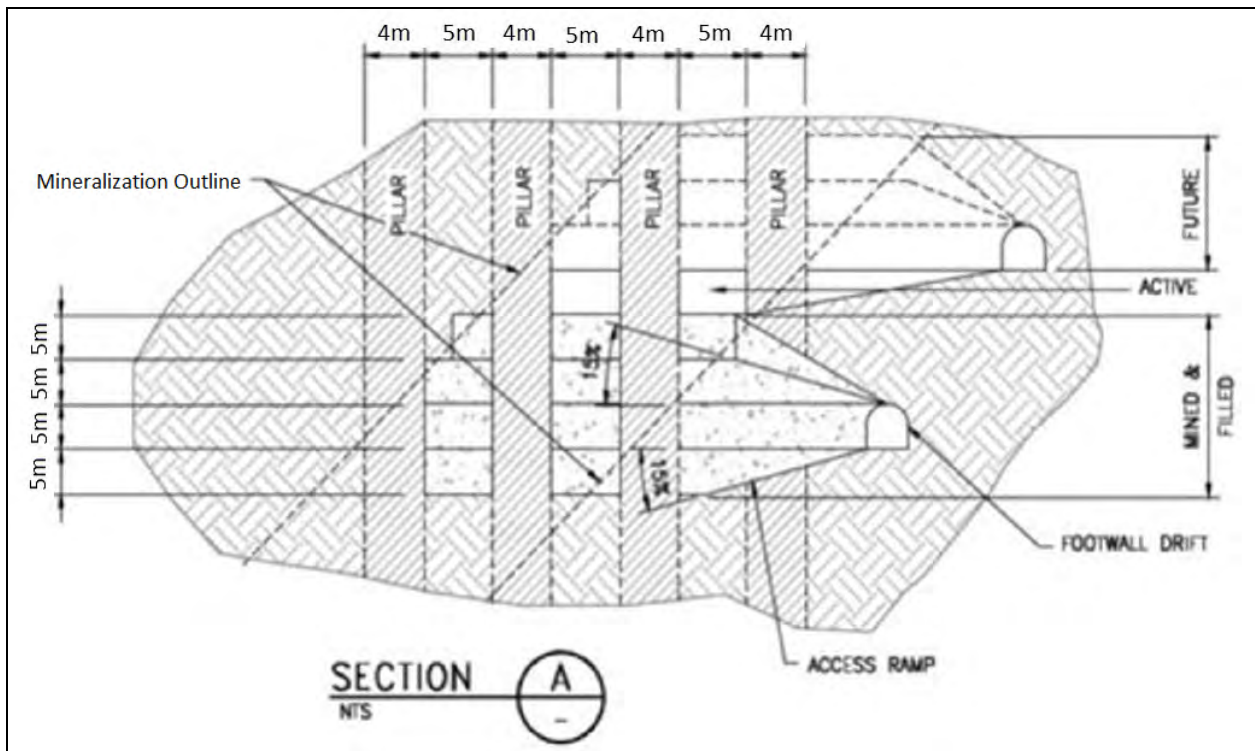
Post Pillar Cut and Fill (PPC&F) Plan View
